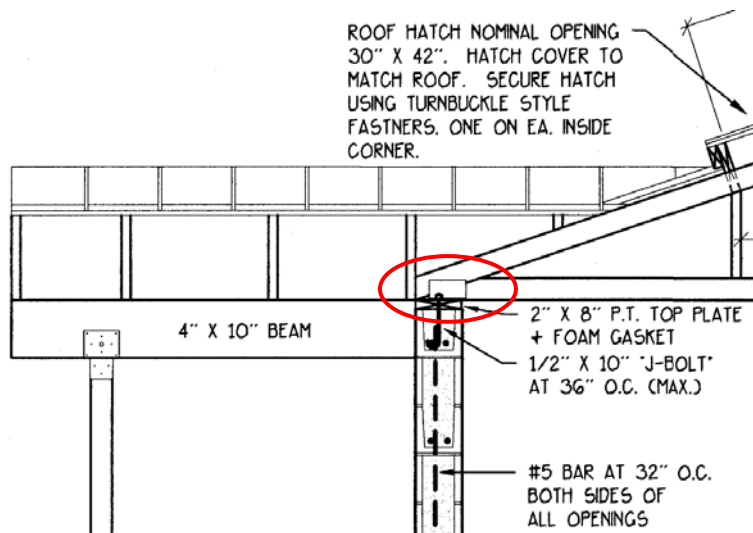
Inadequate Wall Out-of-Plane Anchorage Connection
